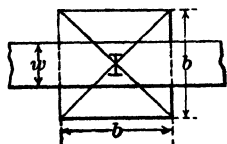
Square Supporting Area. Wall and Concentric Isolated Load
